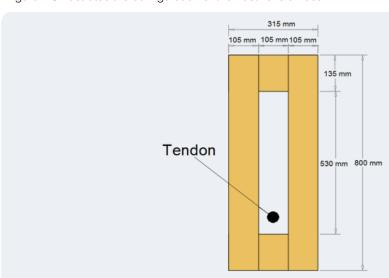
Cross-section of a simply supported post-tensioned beam.
